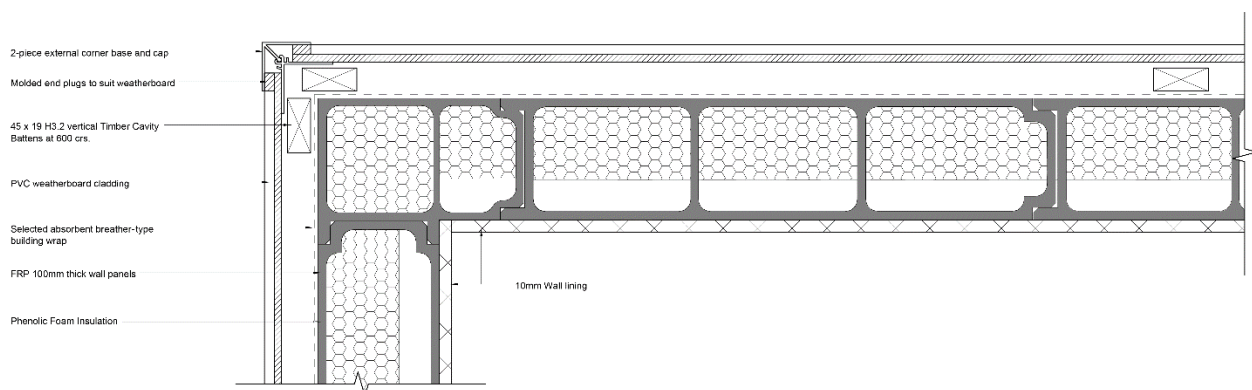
FRP wall panel system-external corner filled with phenolic foam insulation
